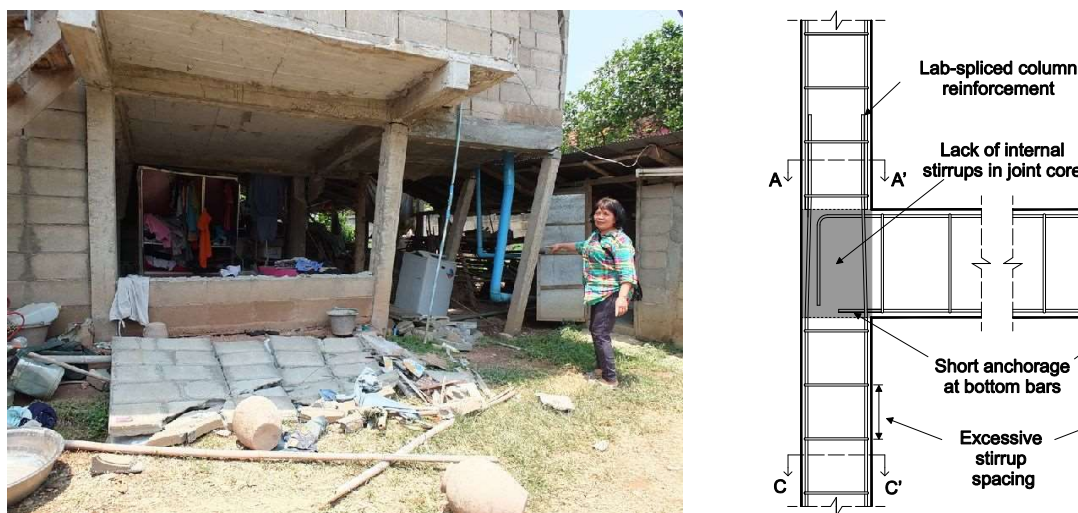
(a) Building partial collapse during the 2014 Mae Lao earthquake (Chaing-rai, Thailand) due to failure of exterior beam-column joints, and (b) typical substandard detailing of beam-column joints in Thailand
